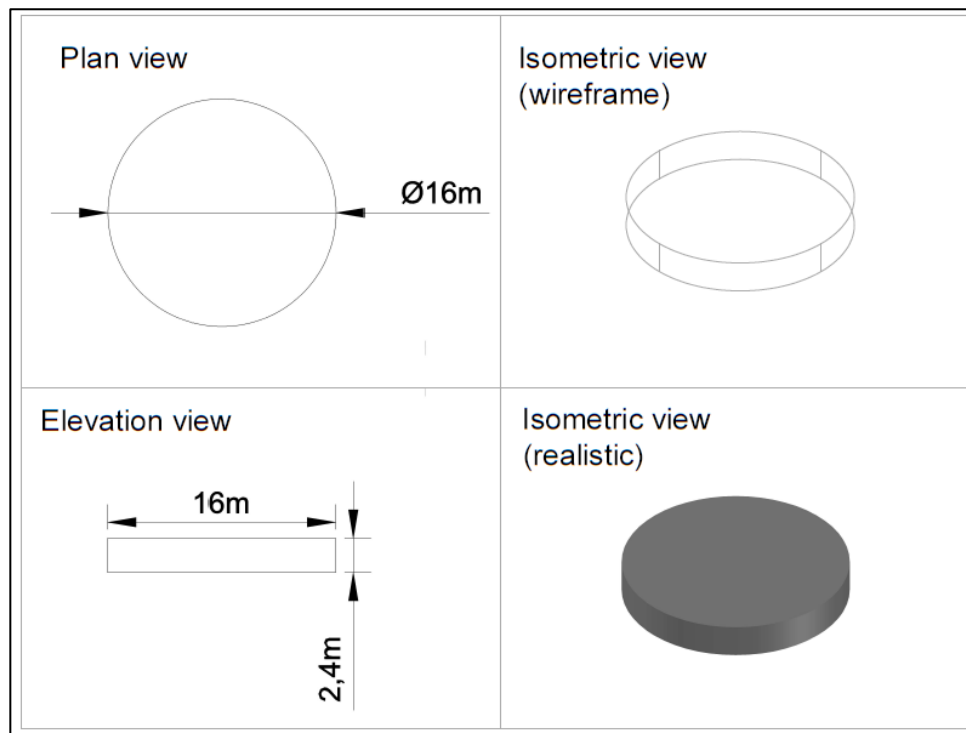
Gravity-based foundation dimensions (drawing created in AutoCAD)
